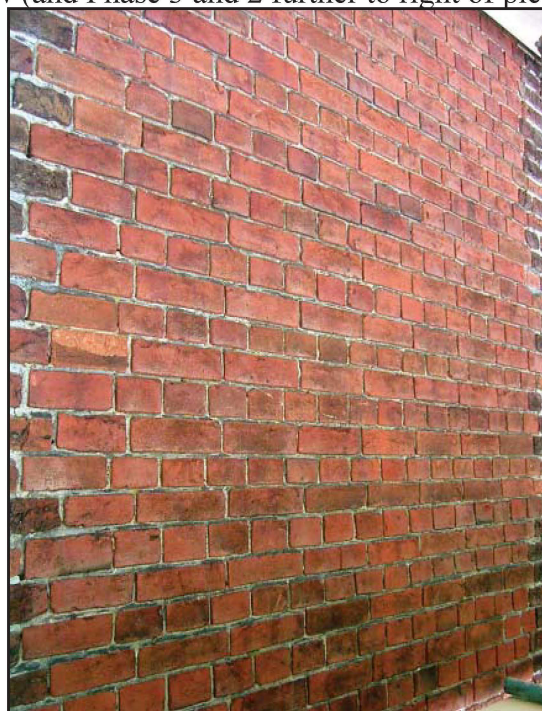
South elevation, external view, second floor, 1888-1924 brick infill
